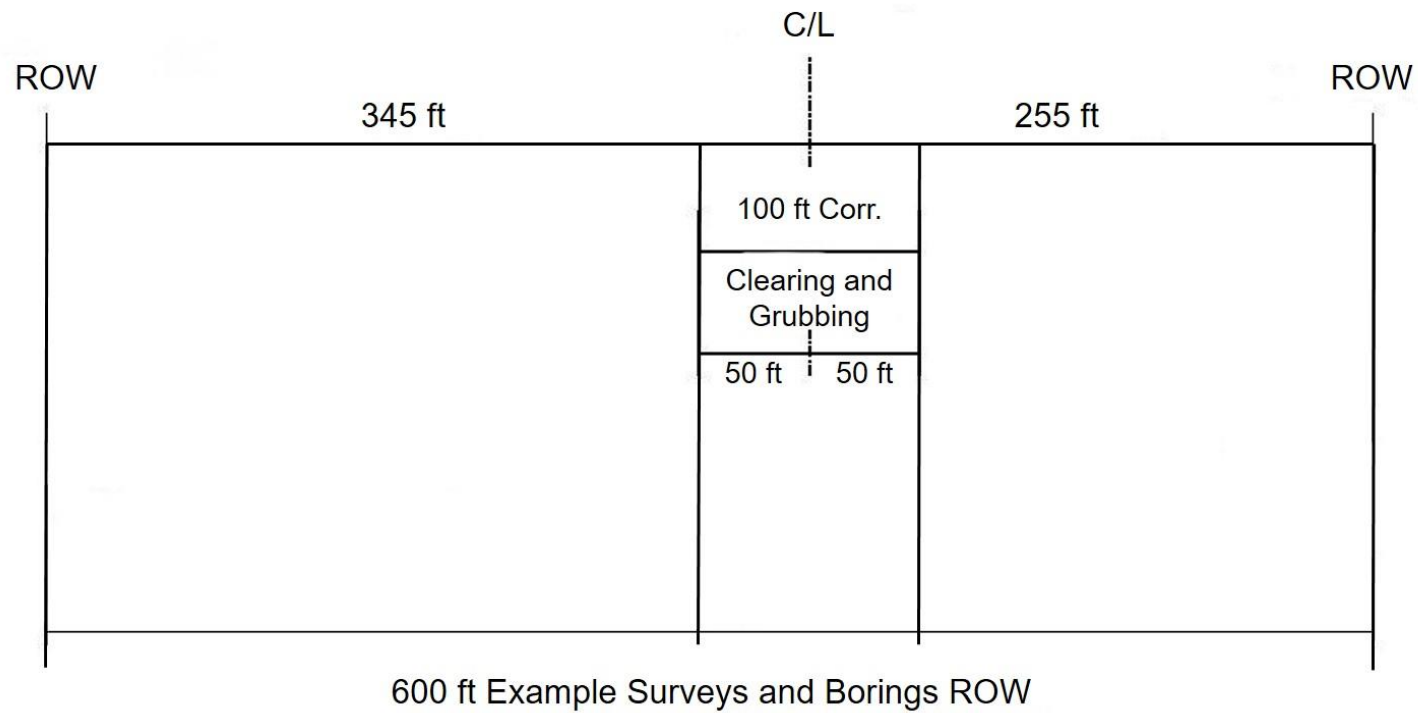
Plan view drawing of a typical ROW for the proposed action.
